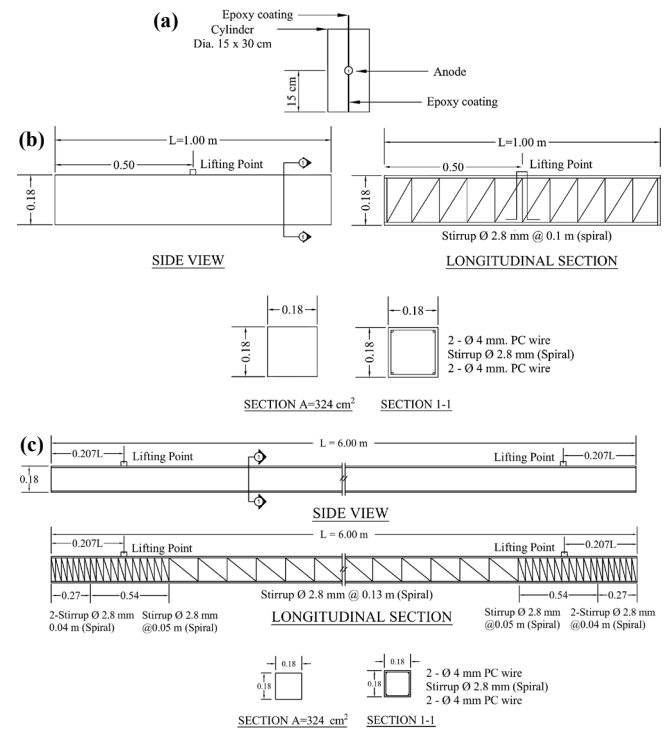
Specimen dimension and reinforcement detail; (a) non-PC cylinder, (b) PC, and (c) large PC specimen.
